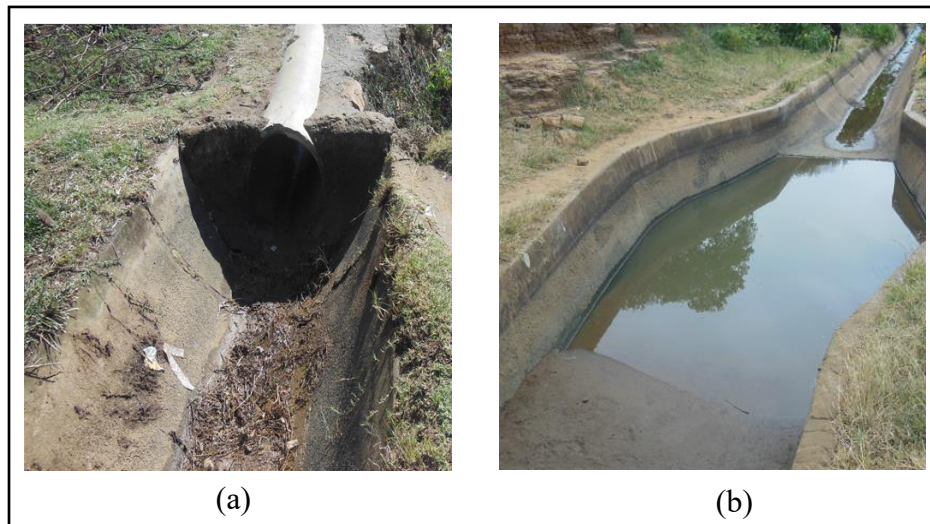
(a) Transition from canal to a $\varnothing 750 \text{ mm}$ pipe and (b) Typical parabolic shaped concrete lined canal changing in cross-section
